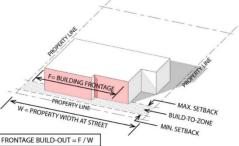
Image showing Building Frontage Build-out calculation
